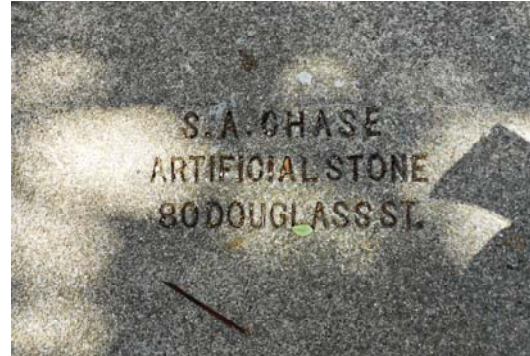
Sidewalk stamp across from 80 Douglass Street, across from workshop of the sidewalk contractor. (Photo by M.R. Corbett, 5 October 2015)
